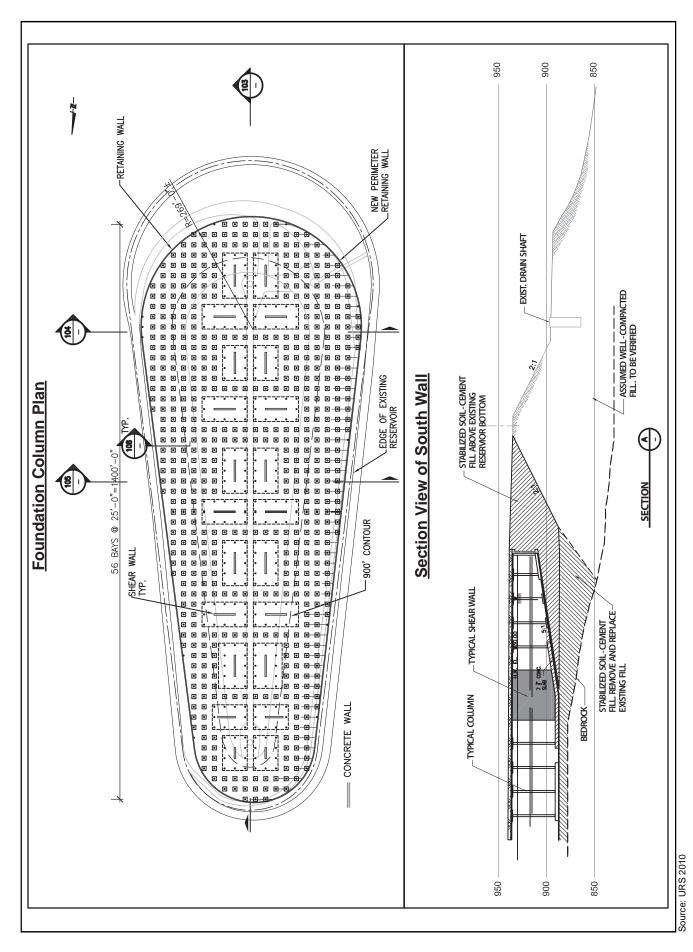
Concept Plan for Proposed Reservoir Bottom
